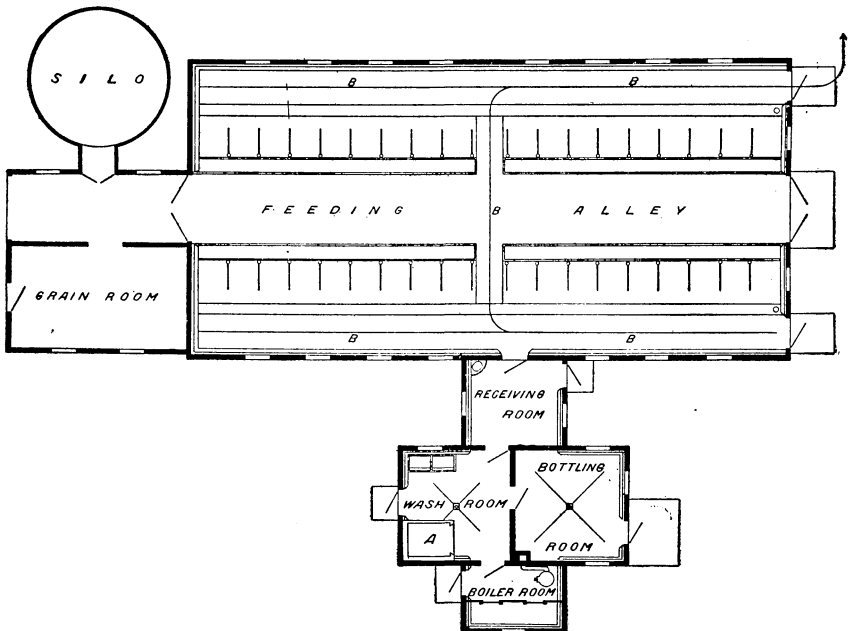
Floor plan of stable for 36 cows, with semidetached milk house.
